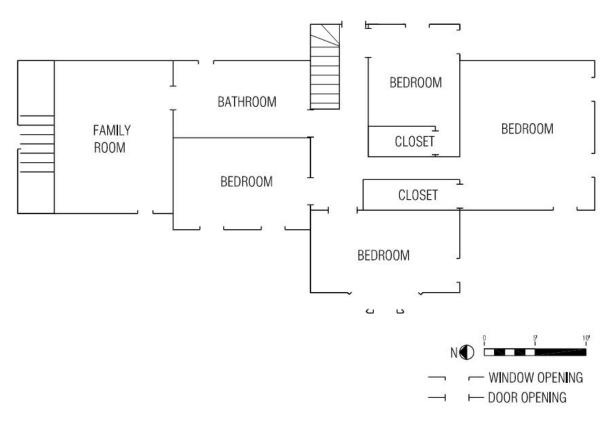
Second floor plan of the William F. Elliott Farmhouse
